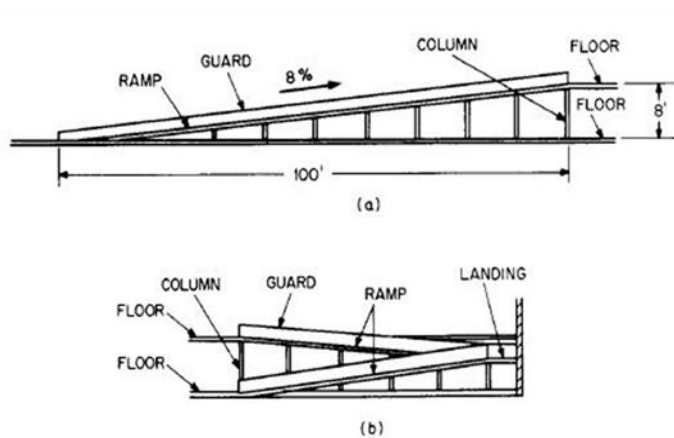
Types of ramps: (a) straight ramp; (b) zigzag ramp.
